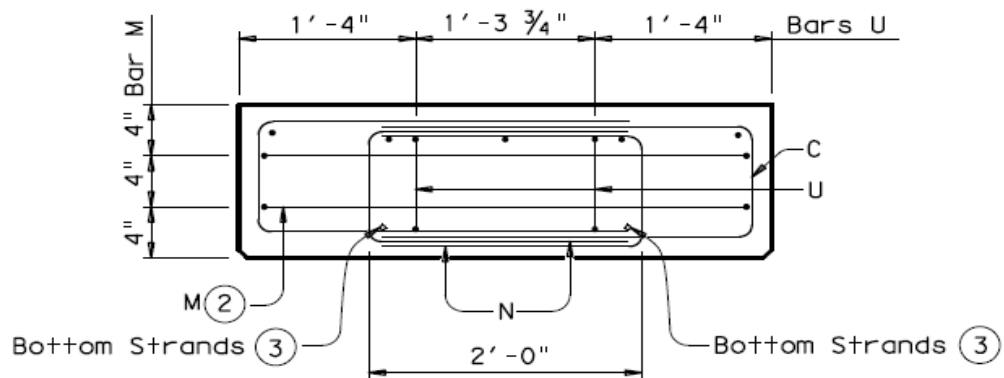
Typical TxDOT Prestressed Concrete Slab Beam Bridge Design (TxDOT 2012)
